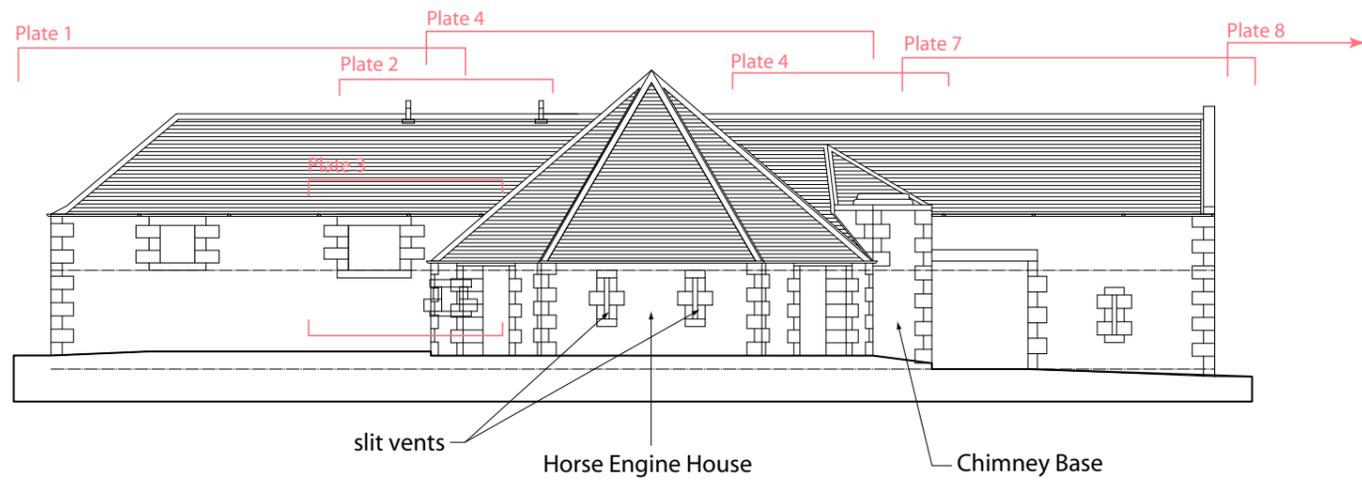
Range A and B (gable end), North Elevation within courtyard
